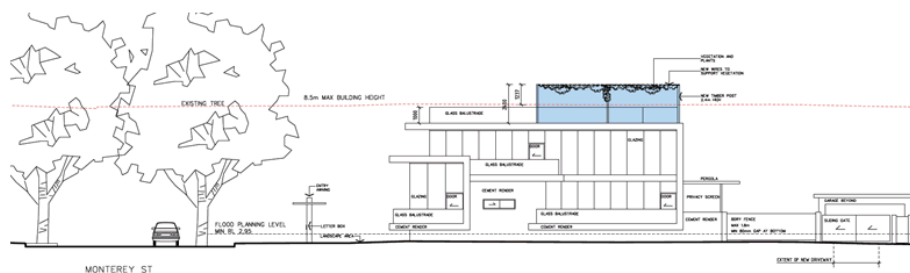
Proposed West Elevation to Chuter Avenue showing the landscaped area covering the rear half of the roof terrace
